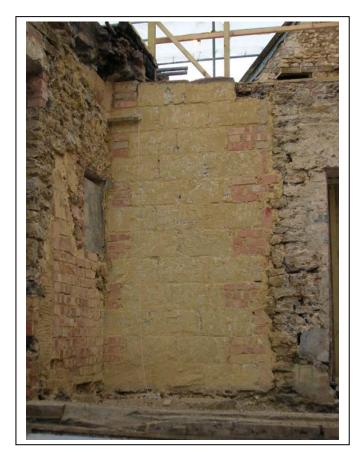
Blocked alterations / repairs adjacent to the chimney base at first floor level.
